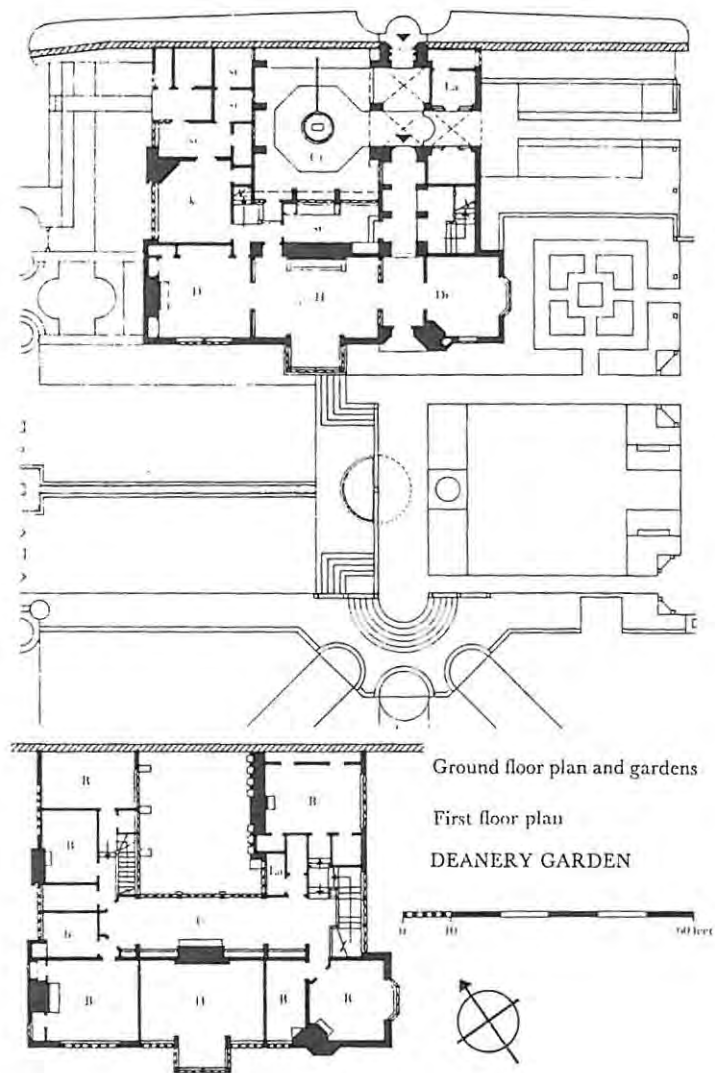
Deanery Gardens. Plan of ground floor and formal garden area.
